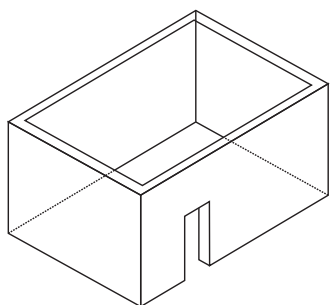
OUTDOOR AREA - EXAMPLE 1
